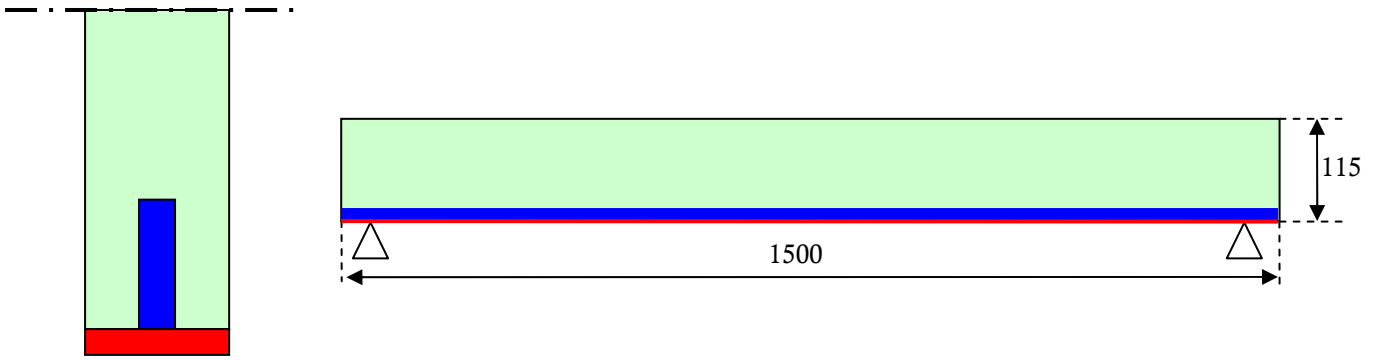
, Left: Close-up of cross-section of bottom of girder. Right: side view. Dimensions in mm.
